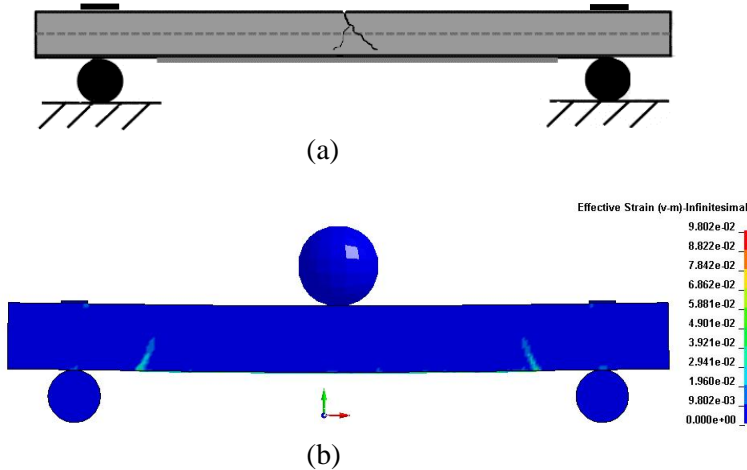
Crack pattern of concrete beam specimens with CFRP strengthening (a) Experimental (b) FEM.
